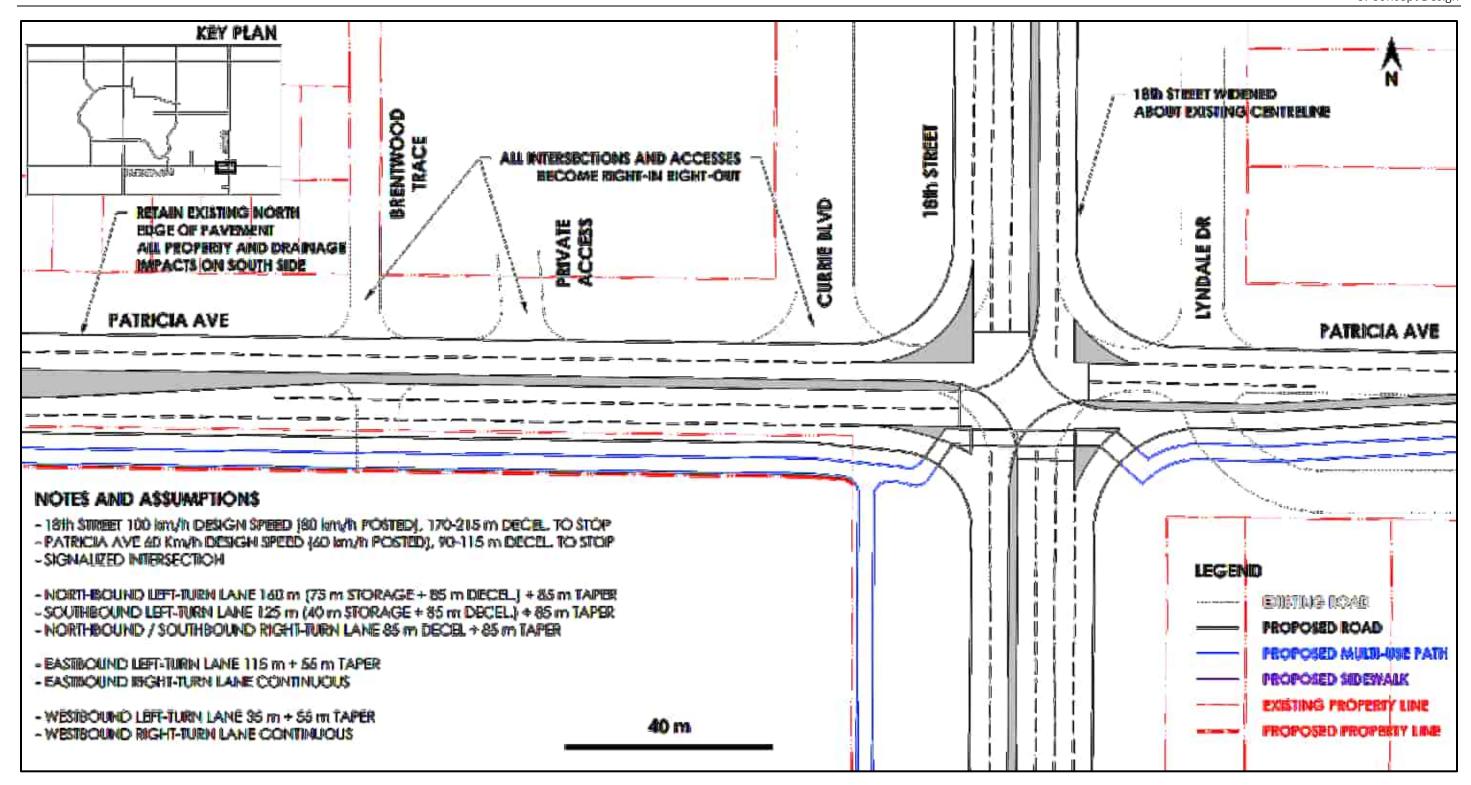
DESIGN SKETCH - 18TH STREET AT PATRICIA AVENUE
